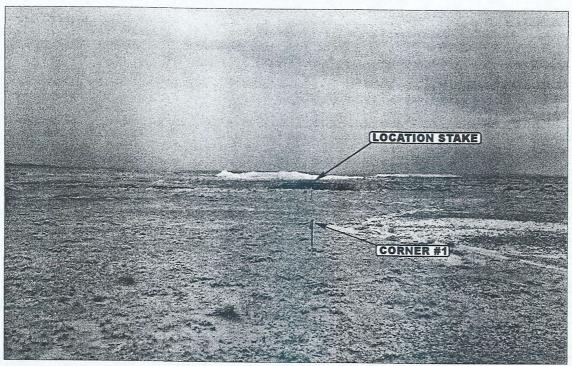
PHOTO: VIEW FROM CORNER #1 TO LOCATION STAKE
